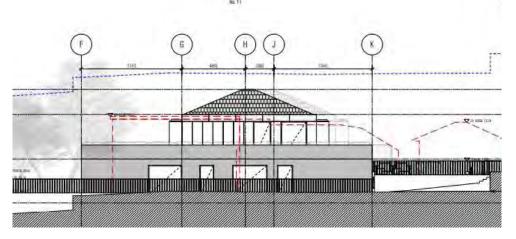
Eastern elevation as viewed from neighbouring property (Mathieson Architects)
